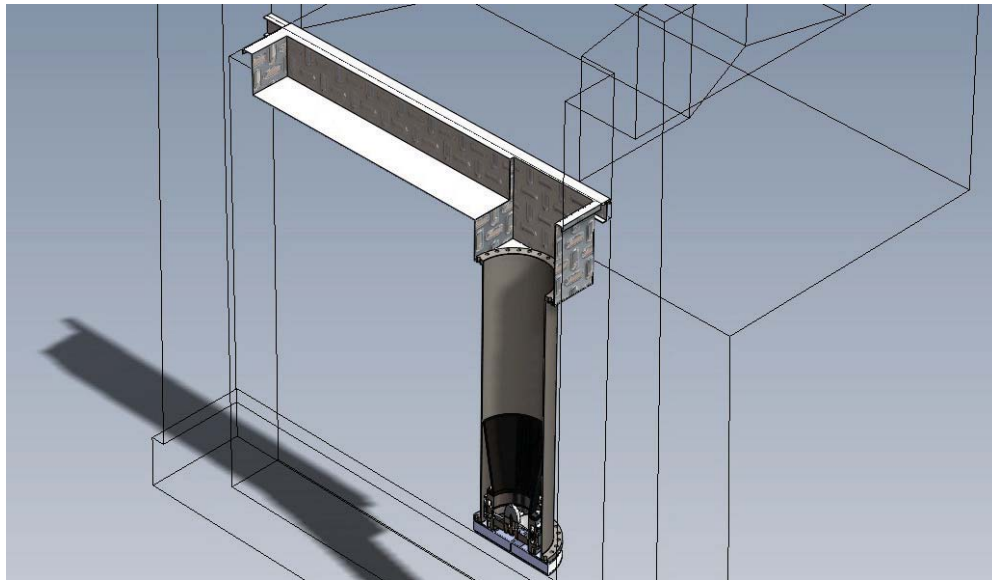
A concept for mounting the turbine/generator in the outfall at the Albany North wastewater treatment plant.
